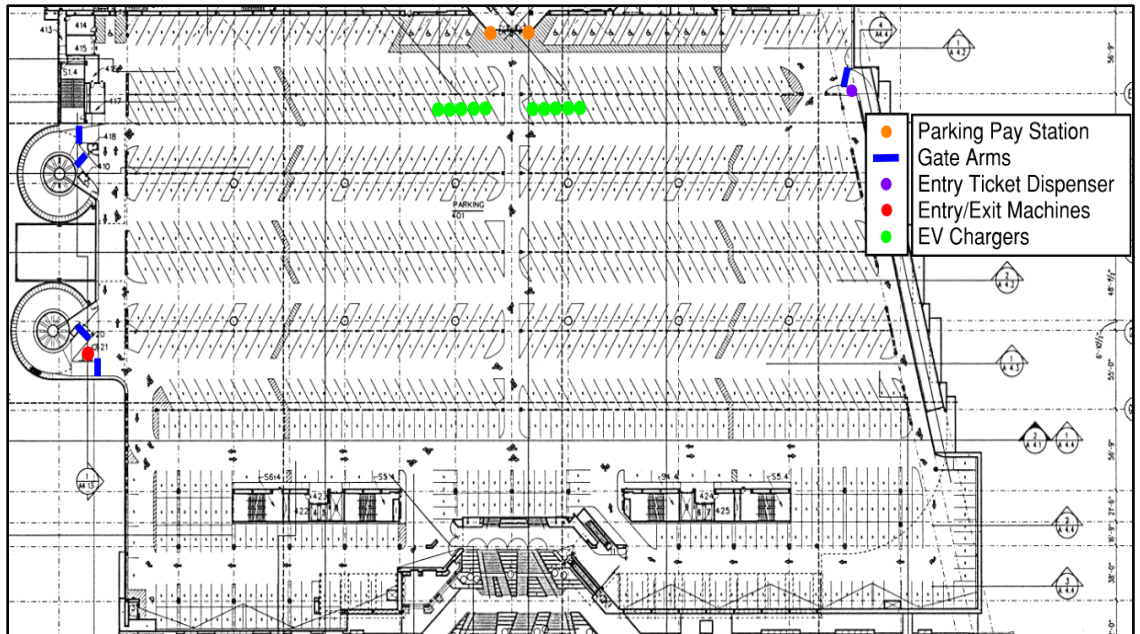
Parking Level Equipment Mark-up. Not to Scale
